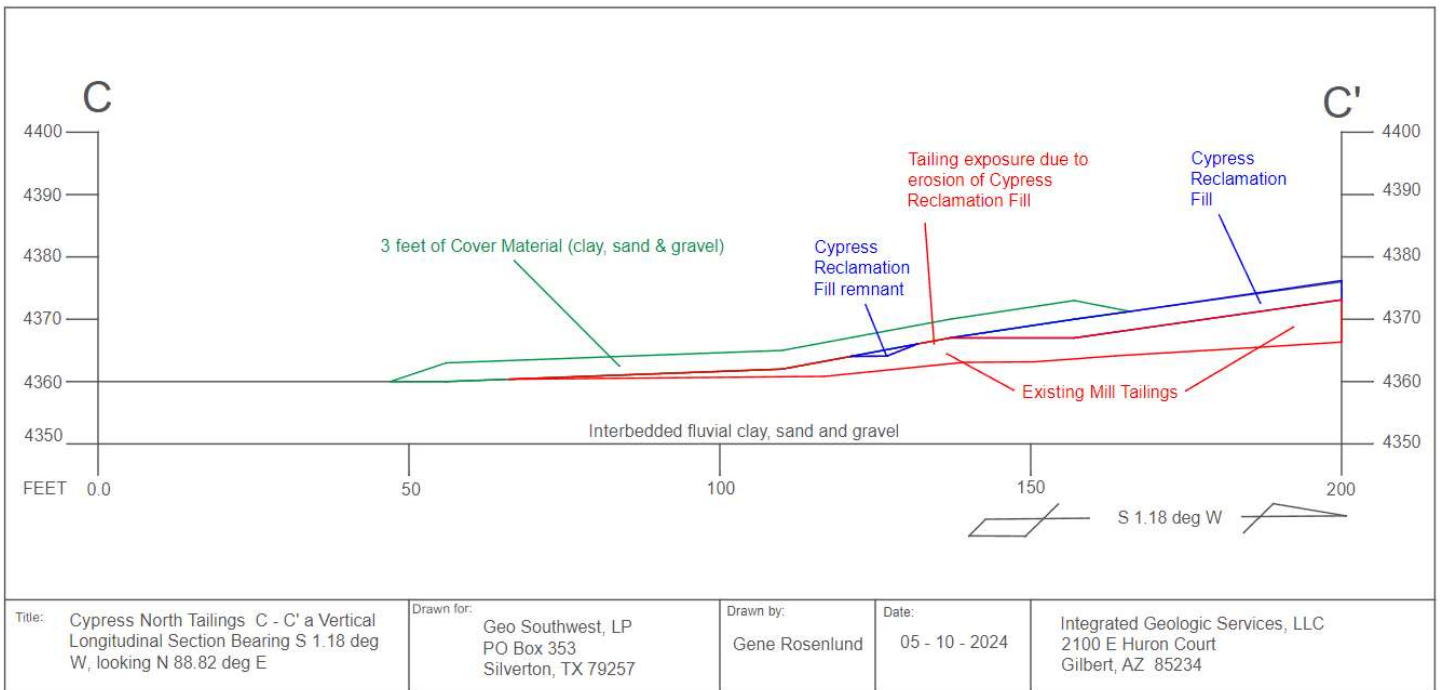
Proposed reclamation of Mill Tailings in the Cypress North Slope Area
